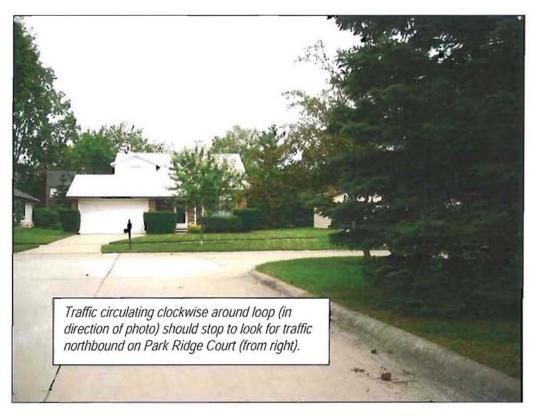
North Side of Turnaround Loop Approaching Park Ridge Court
